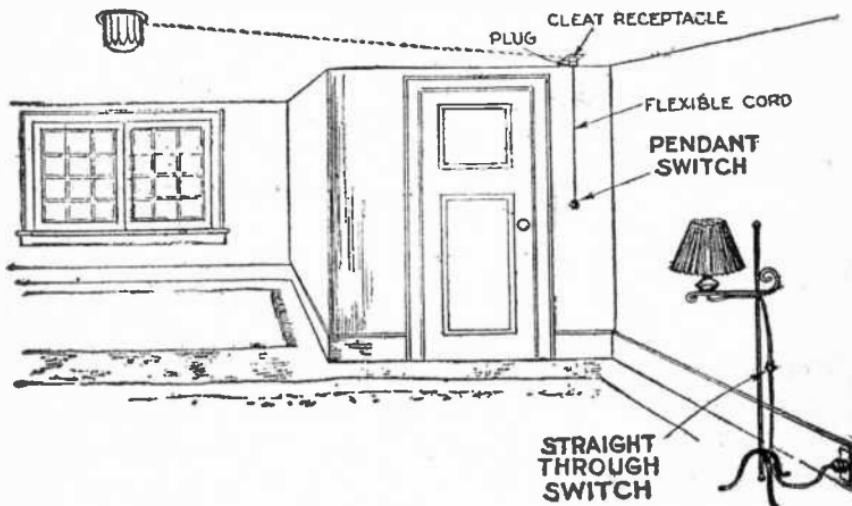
,037.—Interior of room illustrating the installation and use of pendant switch and straight through switch.
